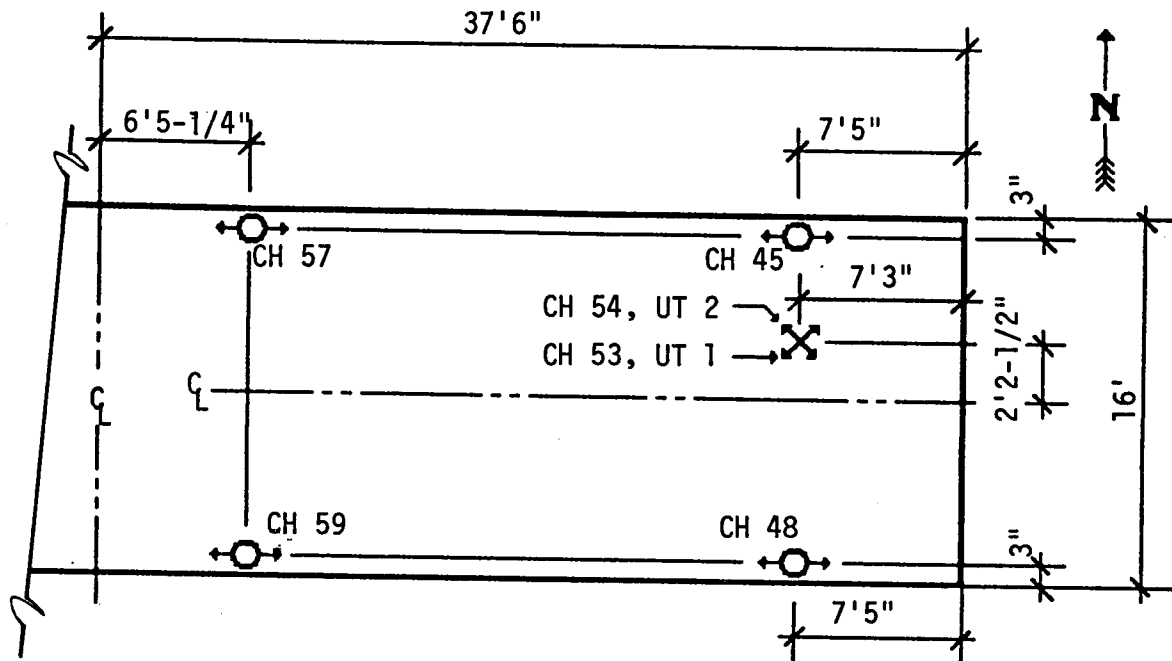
Concrete Strain Gage Layout-Top Plan
